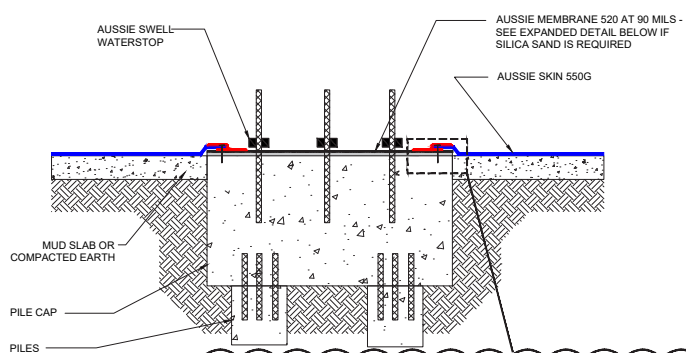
PILE CAP HYDROSTATIC - WRAP AUSSIE SWELL RED AROUND REBAR
